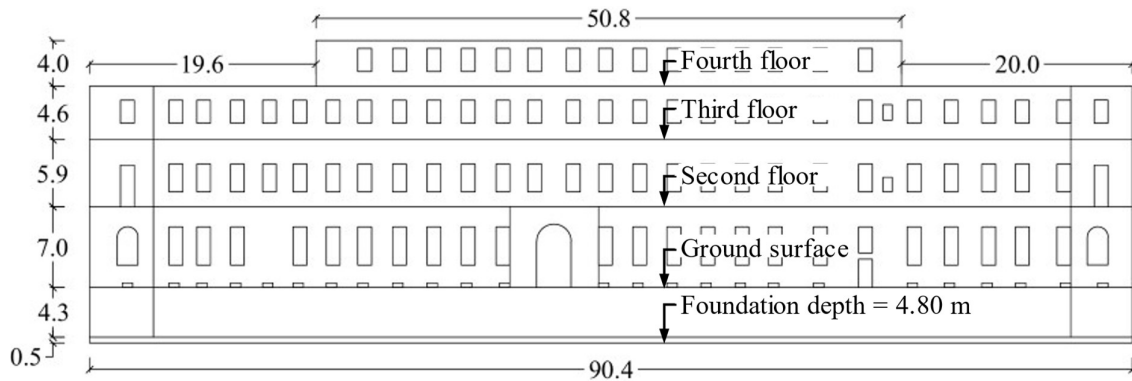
EAST facade. Simplified exterior elevation, Via Carlo Alberto wing
